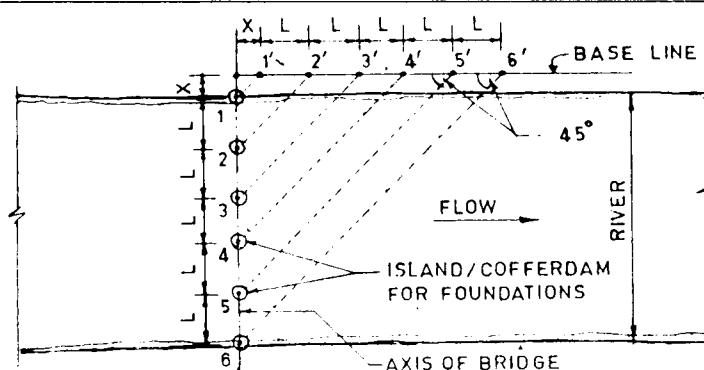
LAYOUT OF FOUNDATIONS IN FLOWING RIVERS
